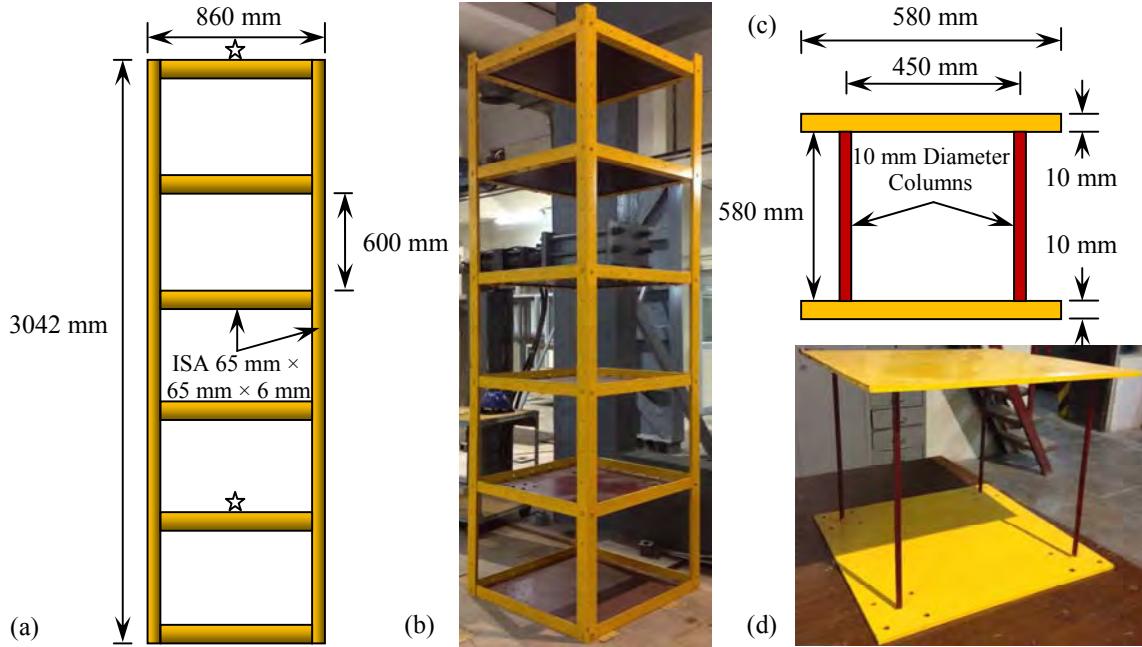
PS and SS: (a) geometry of five storied primary structure, (b) fabricated primary structure, (c) geometry of single storied secondary system, and (d) fabricated secondary system.
